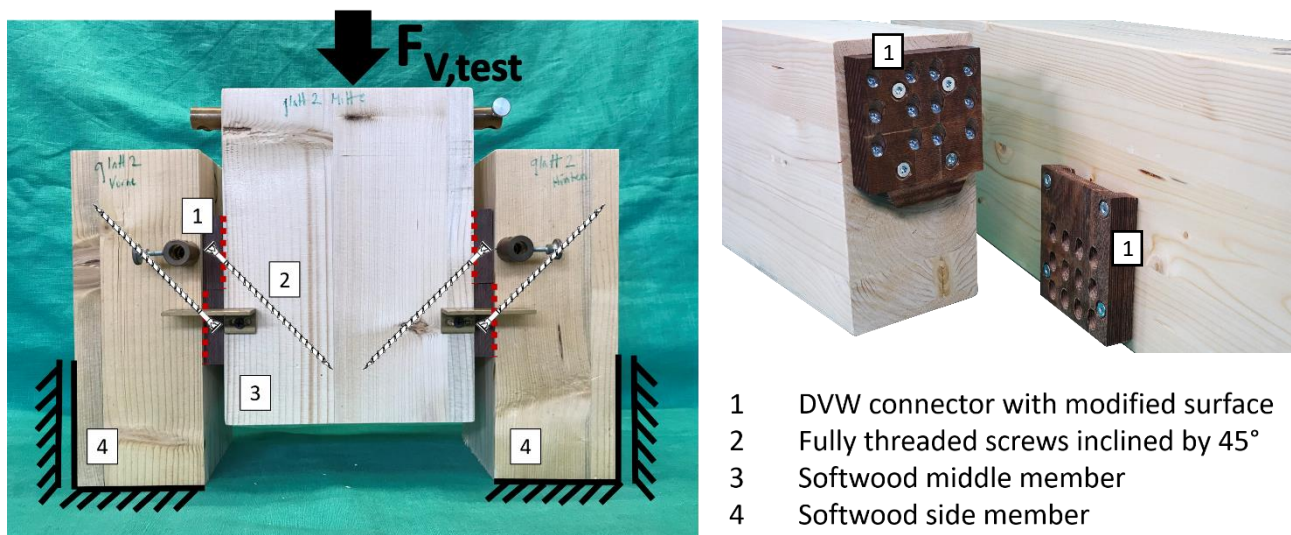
Test setup for push out tests with connectors with modified surfaces and inclined screws.
